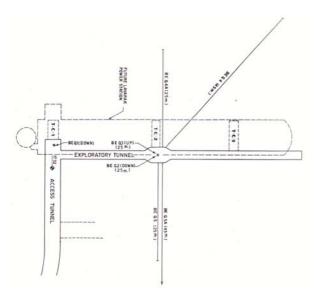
Location of openings for access and in situ testing of the cavern rock mass.
